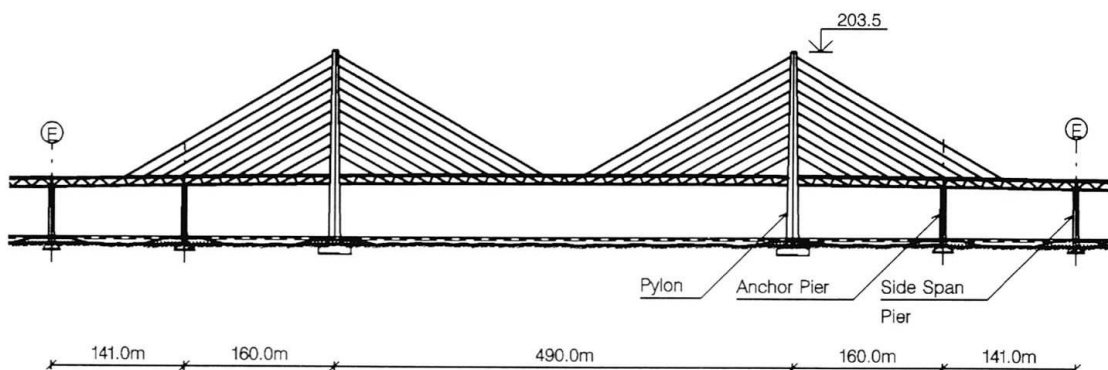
Öresund Link, Cable Stayed Bridge. Side view.
